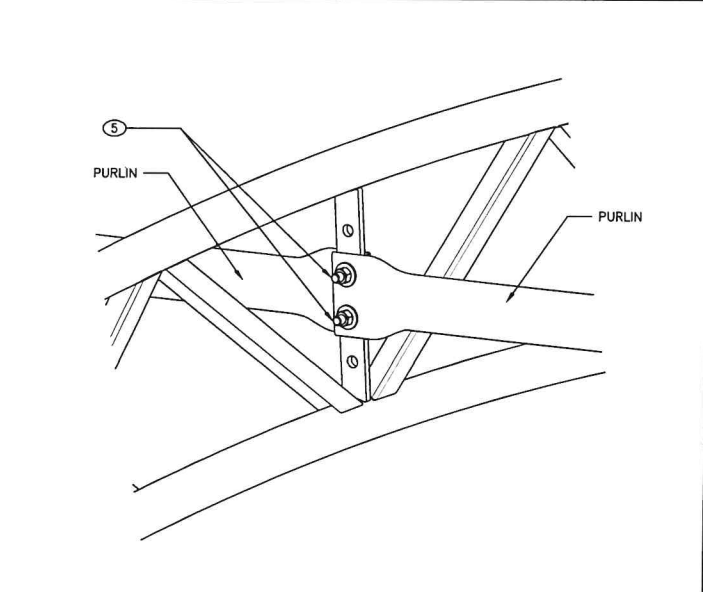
PURLIN AT END AT WELD IN WEB - TWO CABLES
